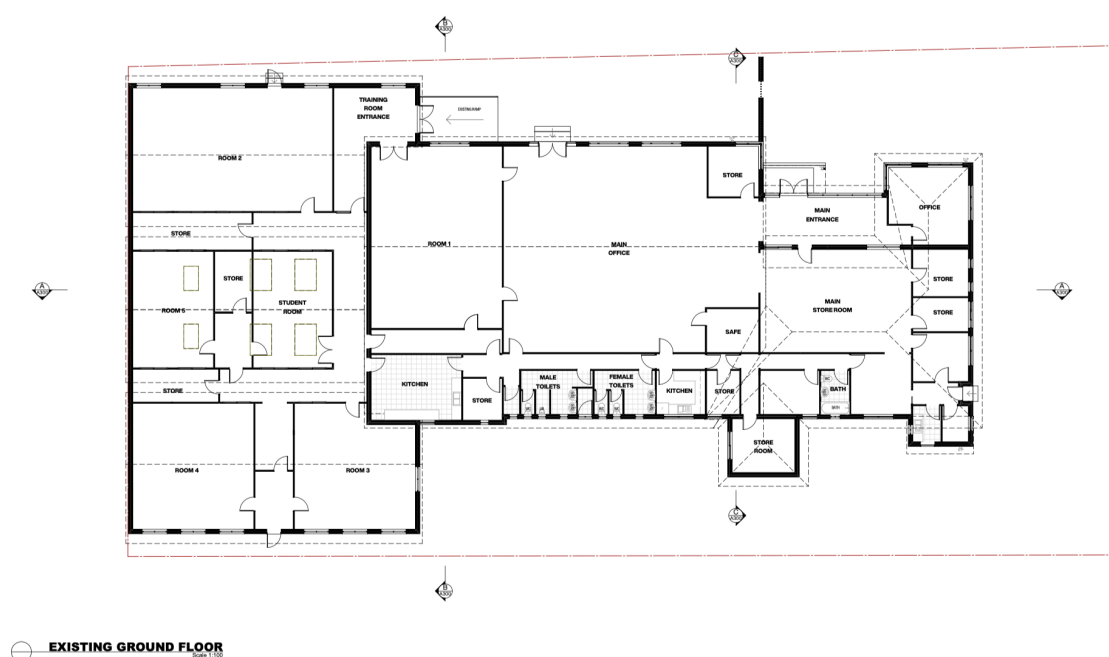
Existing Floor Plan (source: Algorry Zappia & Associates)
